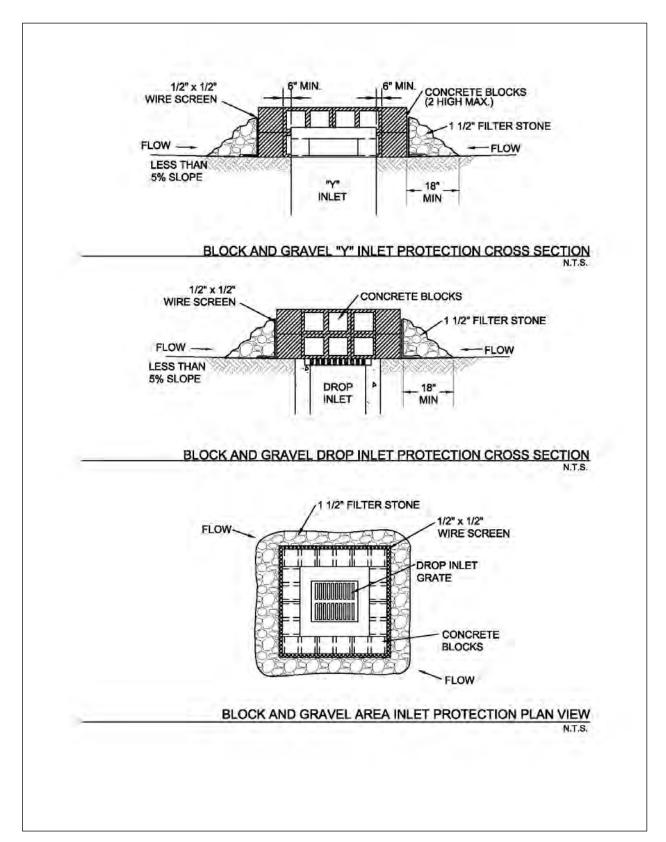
Schematics of Block and Gravel Area Inlet Protection (Source: Modified from City of Plano BMP SP-4)
